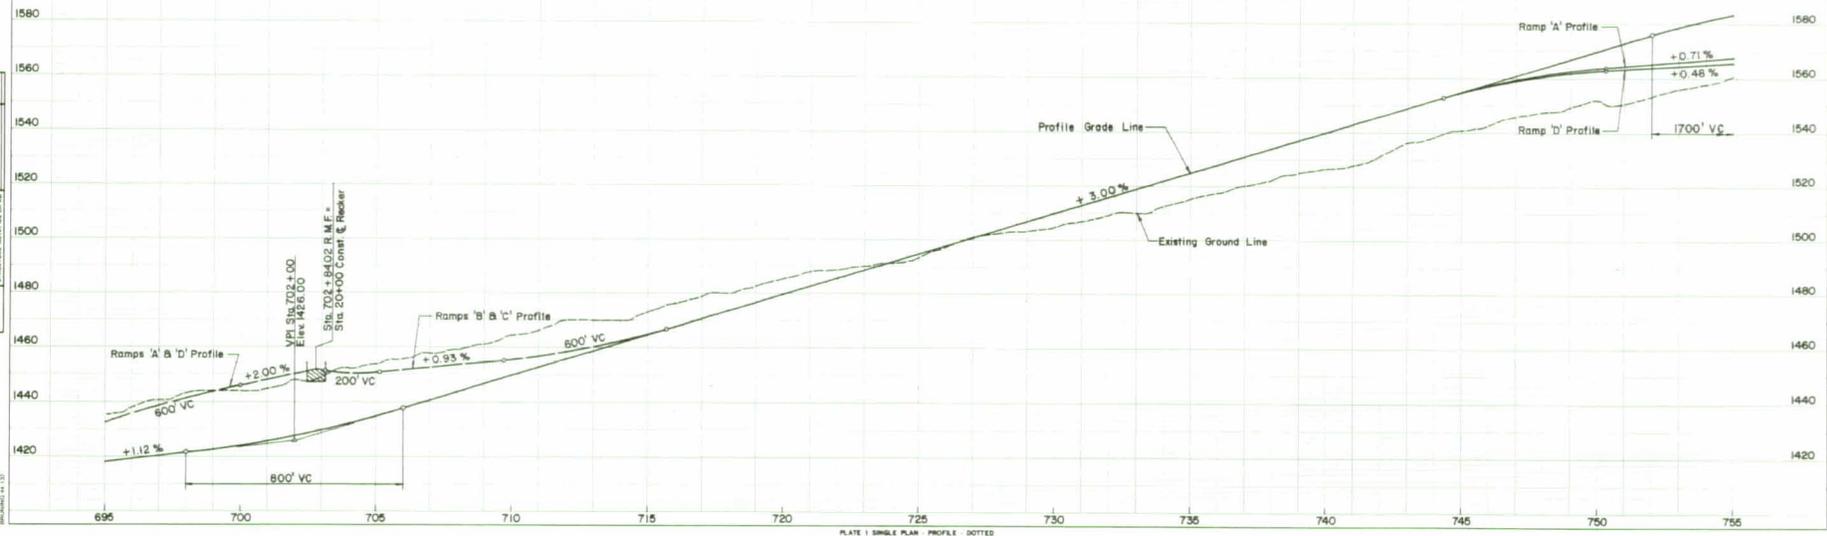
SINGLE PLAN - PROFILE - DOTTED
